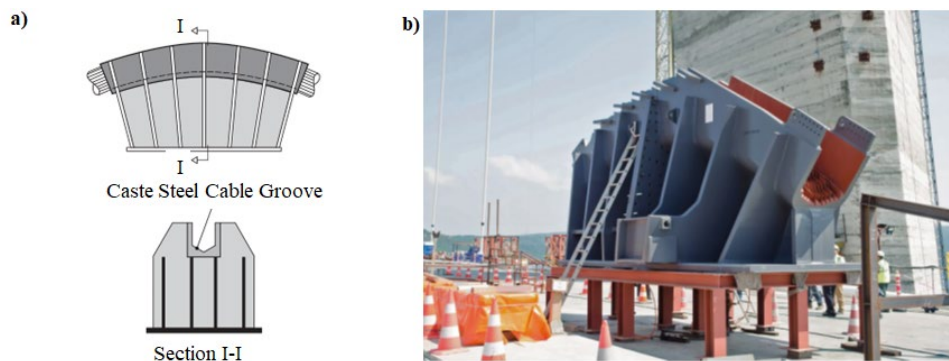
a) Schematic view of the saddle with a cast iron groove; b) Appearance of the saddle with a cast iron groove [2] [15]
